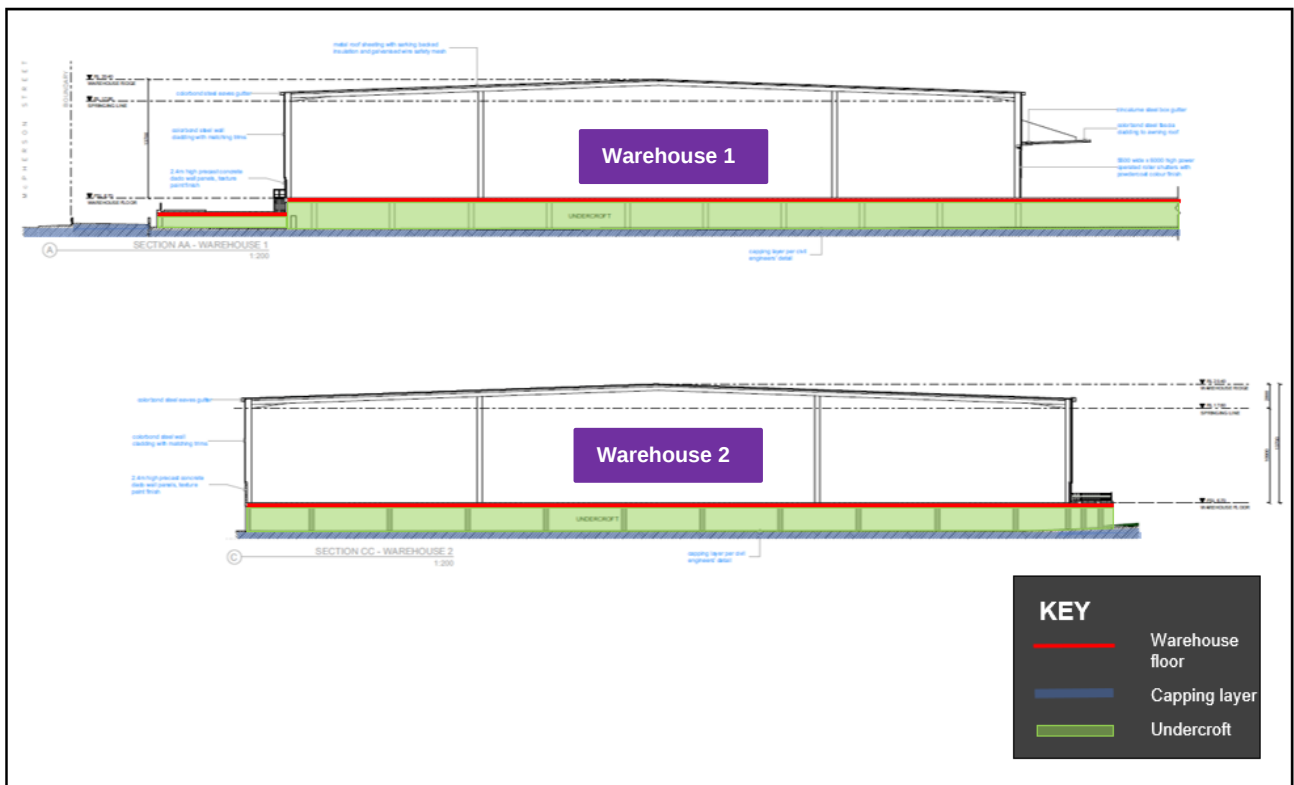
| Cross section of Warehouse Buildings 1 and 2 showing the elevated concrete platform
